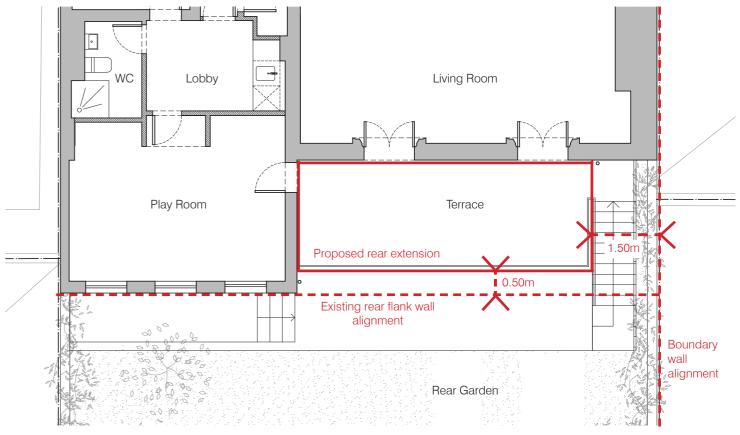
Proposed Upper Ground Floor Level (Drawing no. 041 103)
